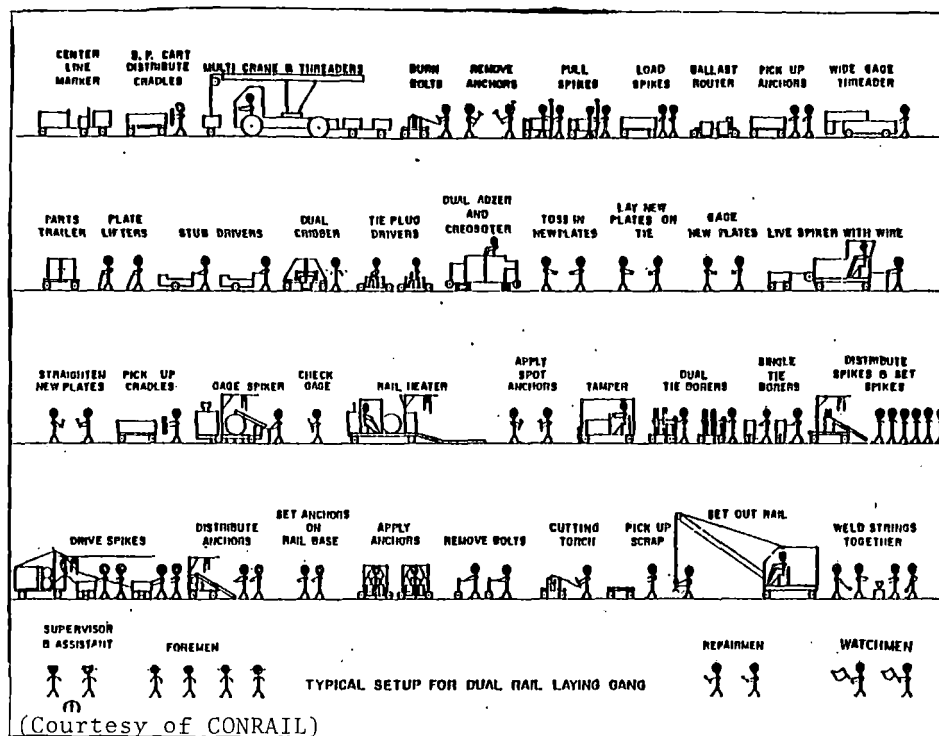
Typical Setup for Dual Rail Laying Gang
